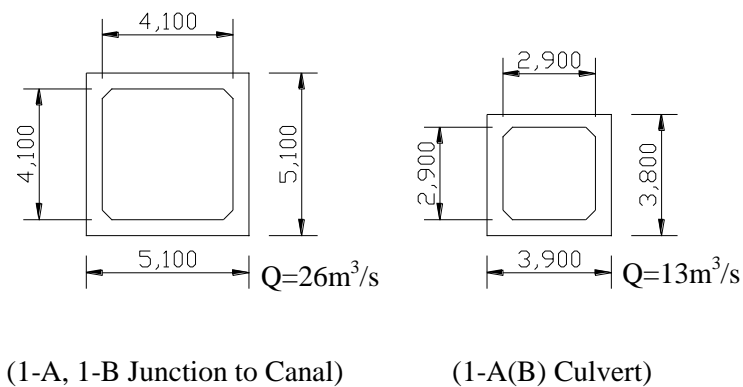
No.1 Section of CW Discharge Culvert at the Construction of O Mon I-A
